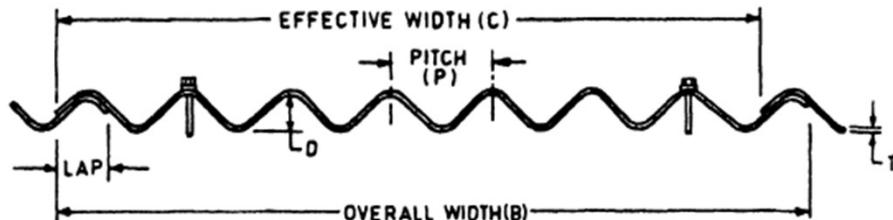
A CORRUGATED SHEET WITH FULL OVERLAP
